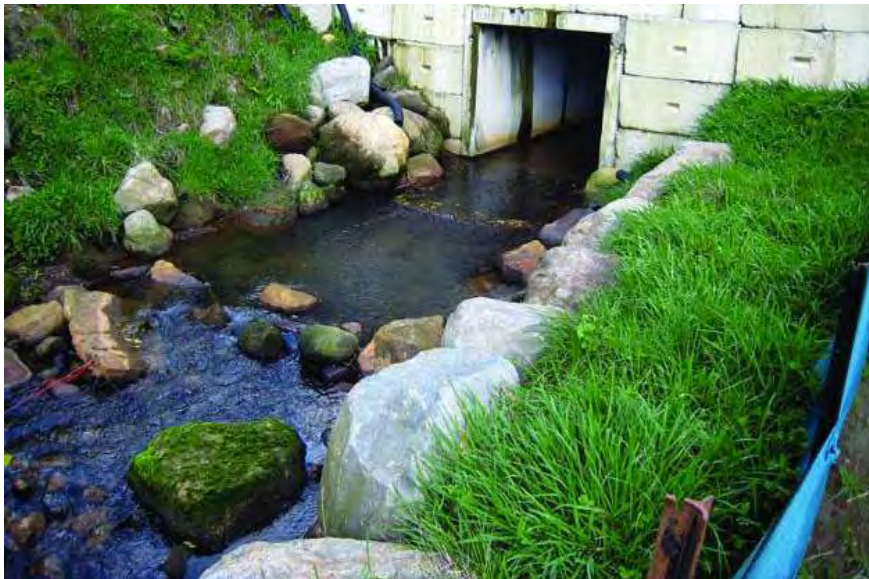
A rock ramp constructed to enable fish passage through a culvert by creating a pool downstream. (Photo credit: NIWA)
